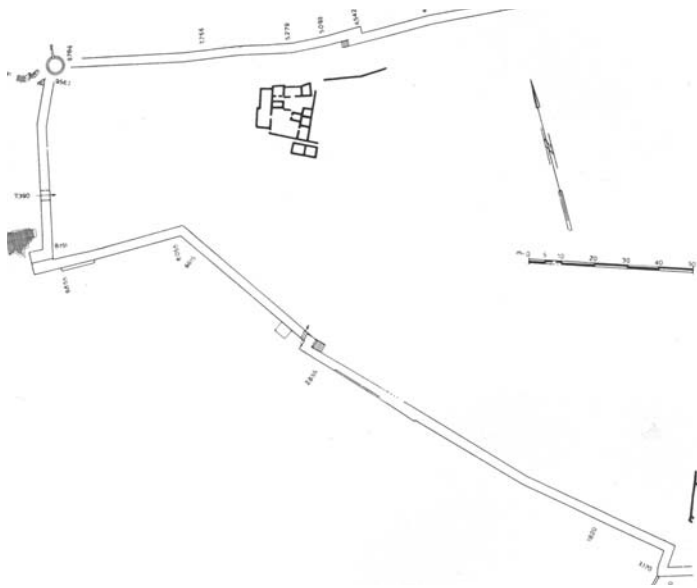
Plan of circuit walls at Capo Soprano, Gela
